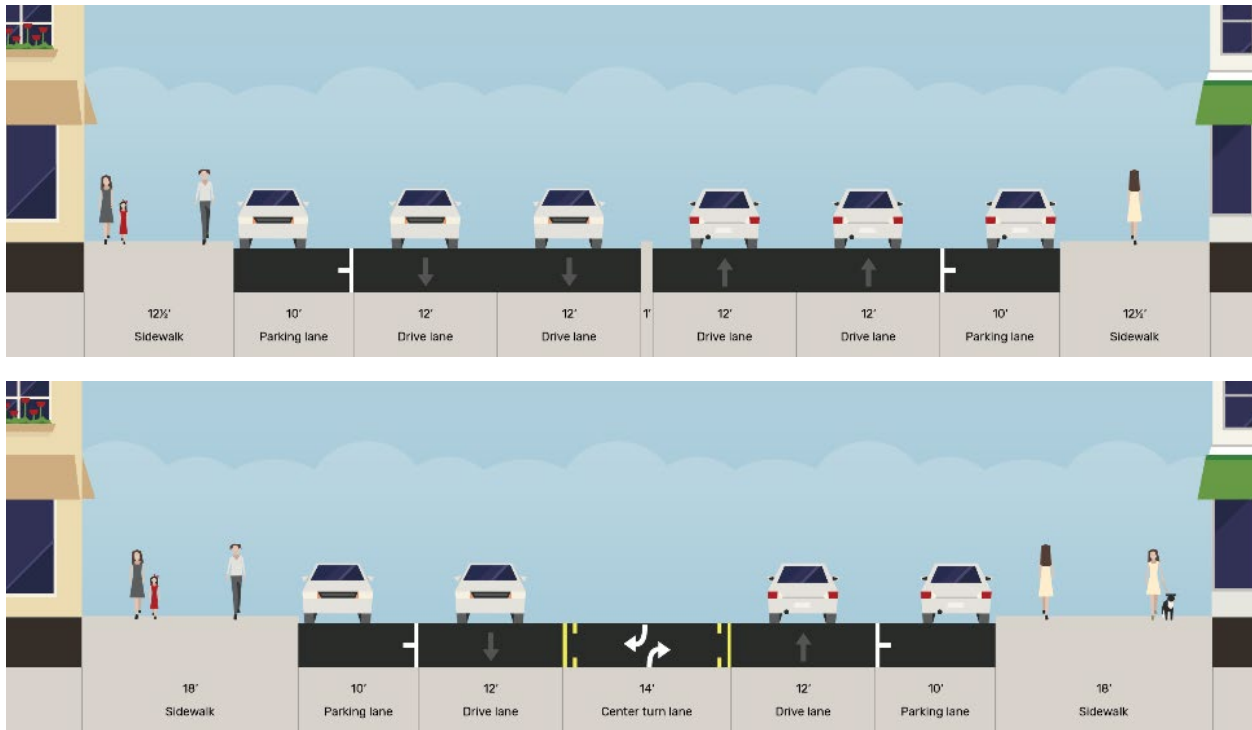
Cross section diagram of Highway 78 / Lake Avenue in Battle Lake, MN before (top) and after (bottom) road redesign.
